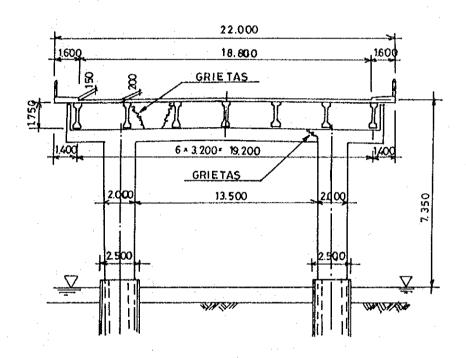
Cross Section of Juan Pablo II Bridge
